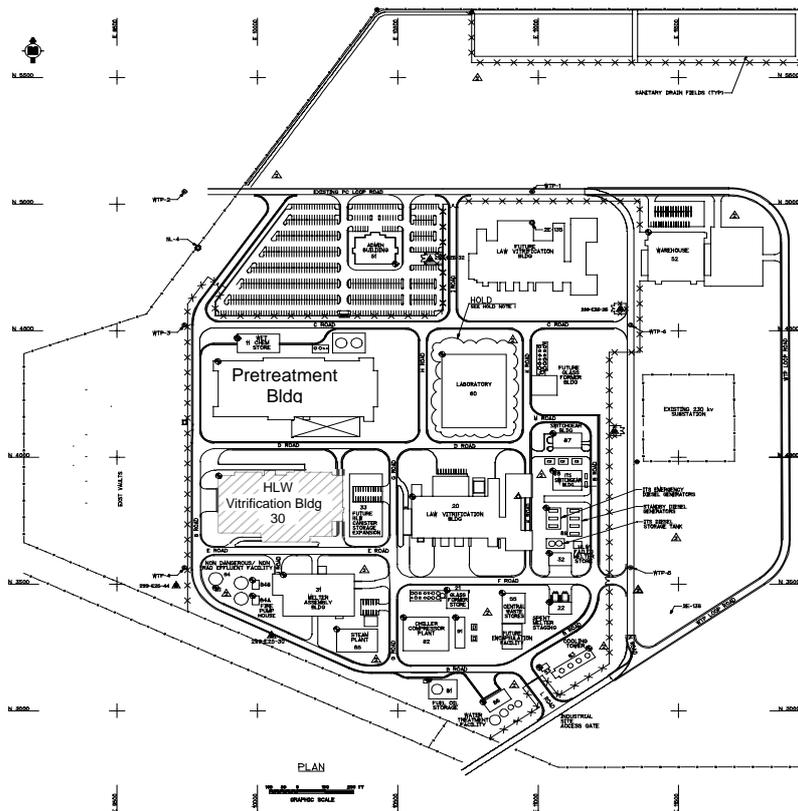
General Plan Arrangement of the RPP-WTP Facility
